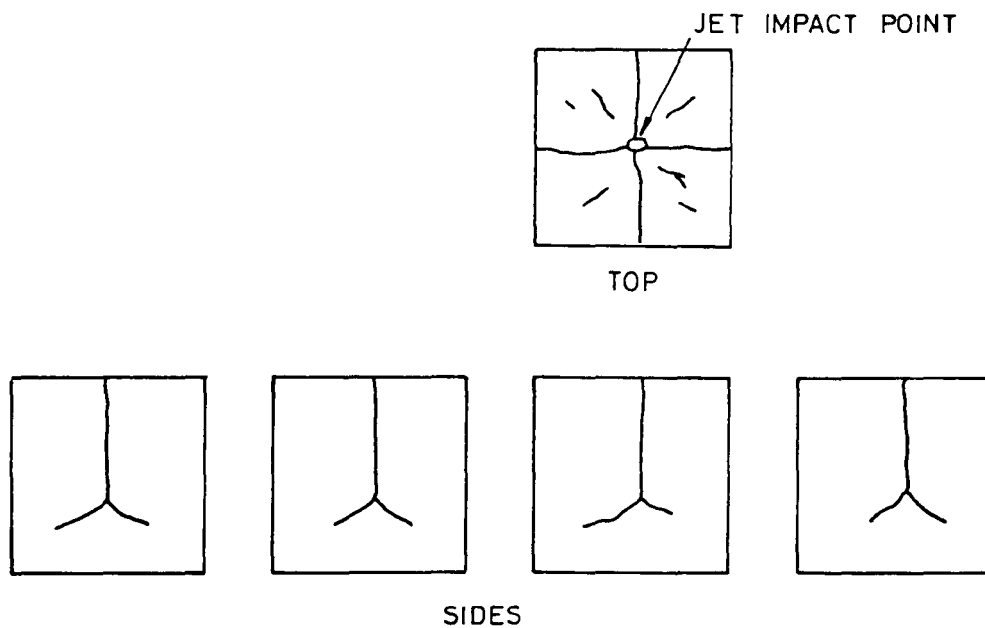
CRACKS IN A 380mm SAND/GRAVEL CONCRETE CUBE (43g SHAPED CHARGE JET IMPACT)
